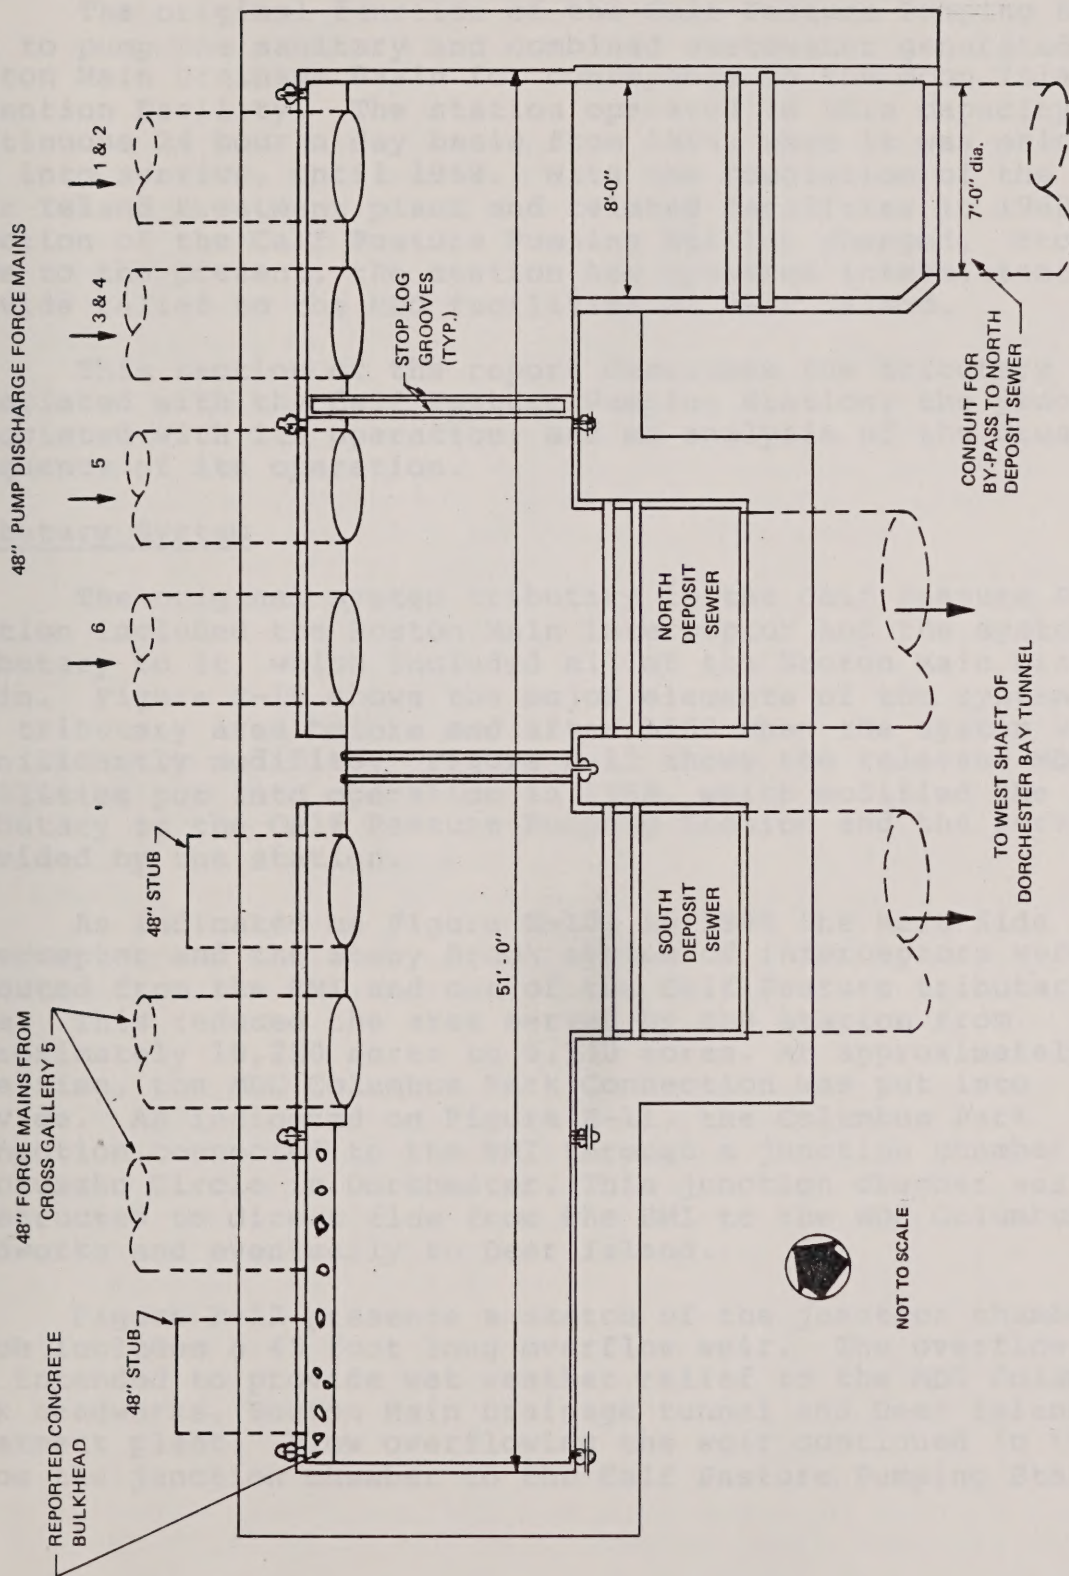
PLAN OF PIPE CHAMBER AT THE CALF PASTURE PUMPING STATION
